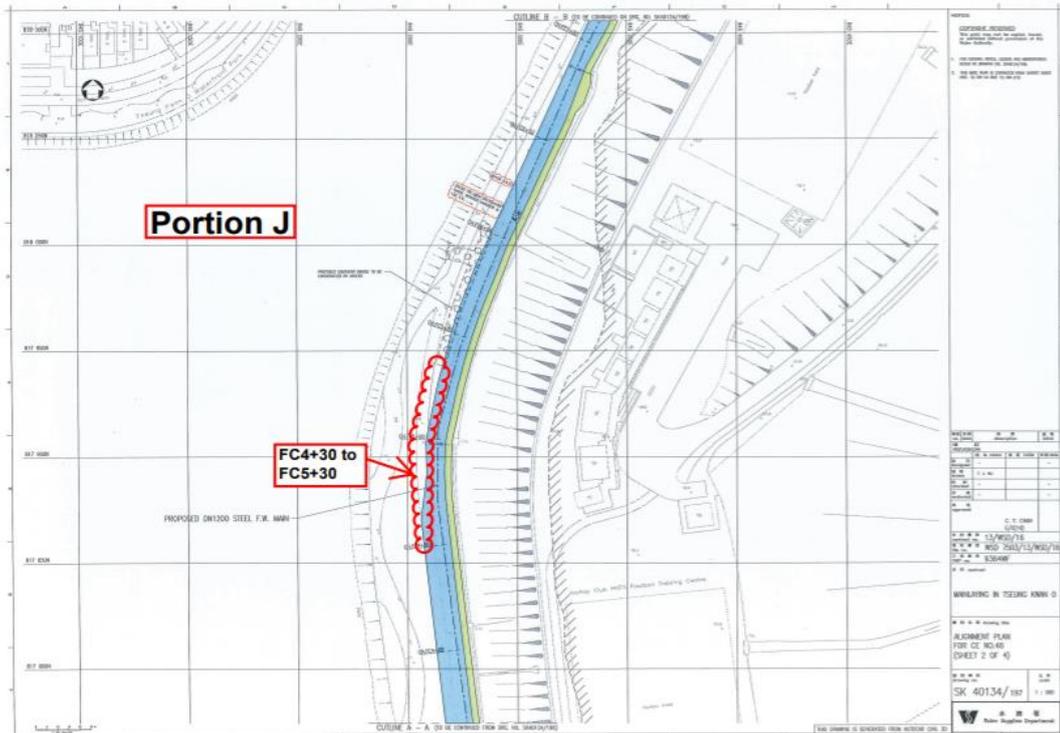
Location Plan – Landfill Stage 1 (Area FC4+30 -FC5+30)
